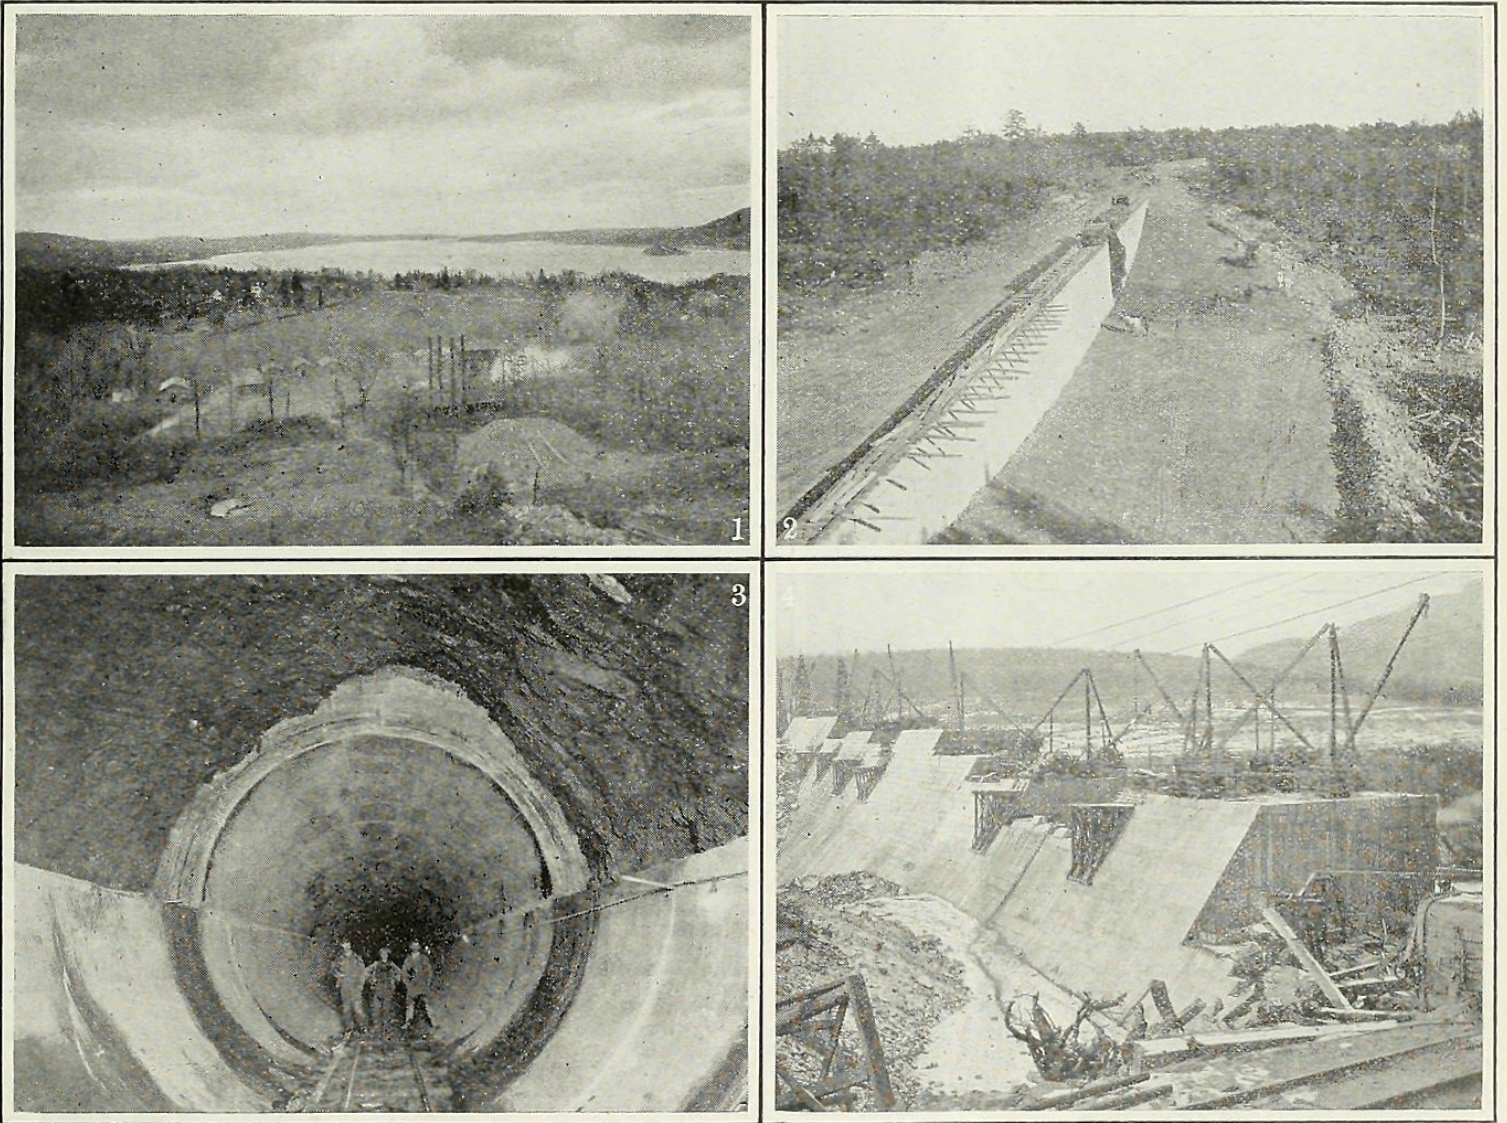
Overlooking the site of the pressure tunnel eleven hundred feet under the Hudson River just north of West Point.
